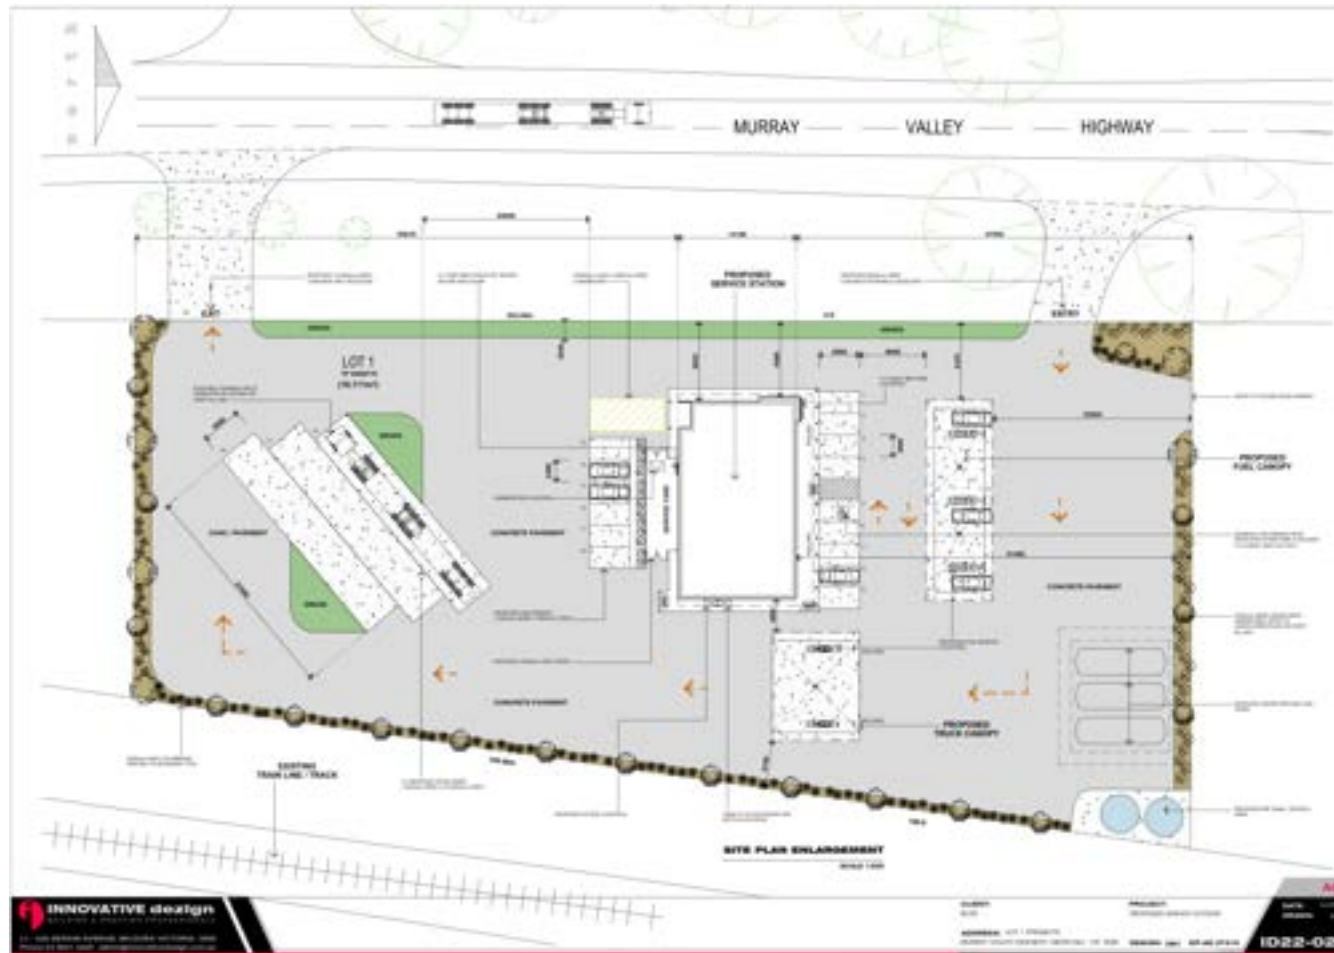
Site Plan Enlargement for development at 5630 Murray Valley Highway, Swan Hill
